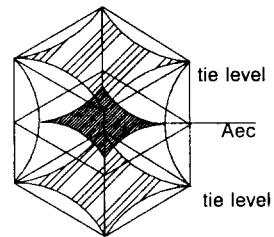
Confined concrete model of the critical section in tied columns
